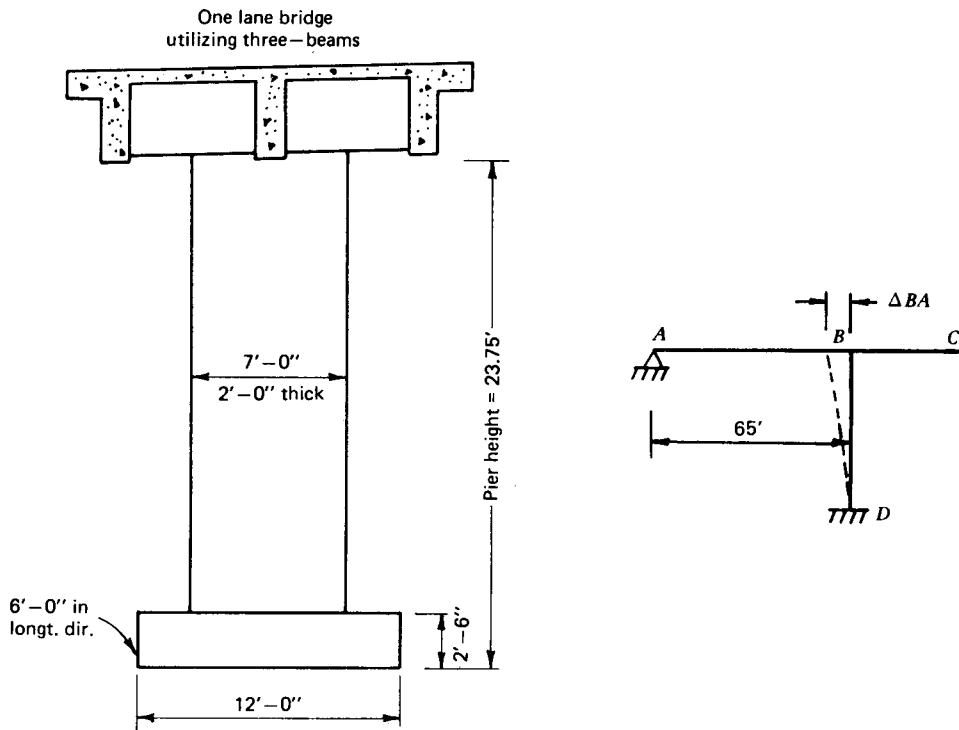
(a) Pier elevation of design example; (b) rigid frame of bridge elevation.
